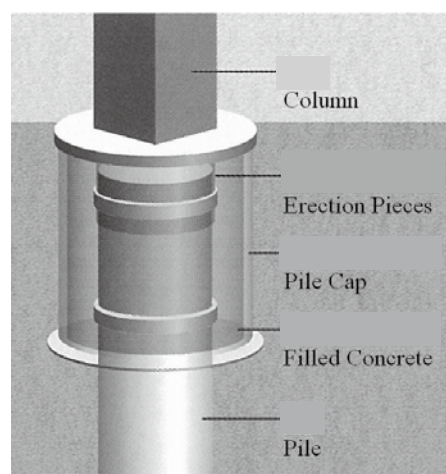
“Ichi-Ichi Kiso,” Non-footing column pile joint
